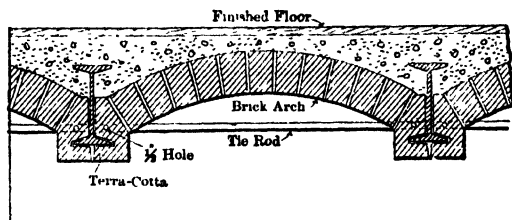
Brick Floor-arch. Government Printing Office, Washington, D. C.
